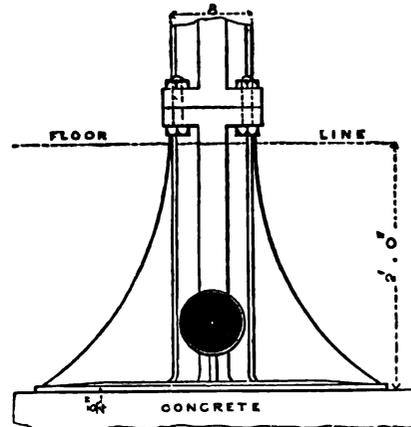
Elevation of Base-Plate, showing connection with Column above it.
